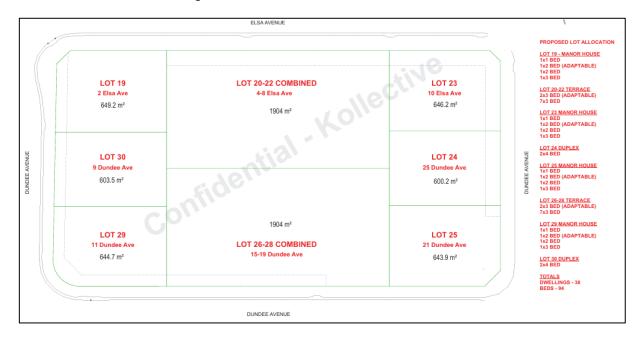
Initial Concept Layout Plan - Proposed Dwellings
